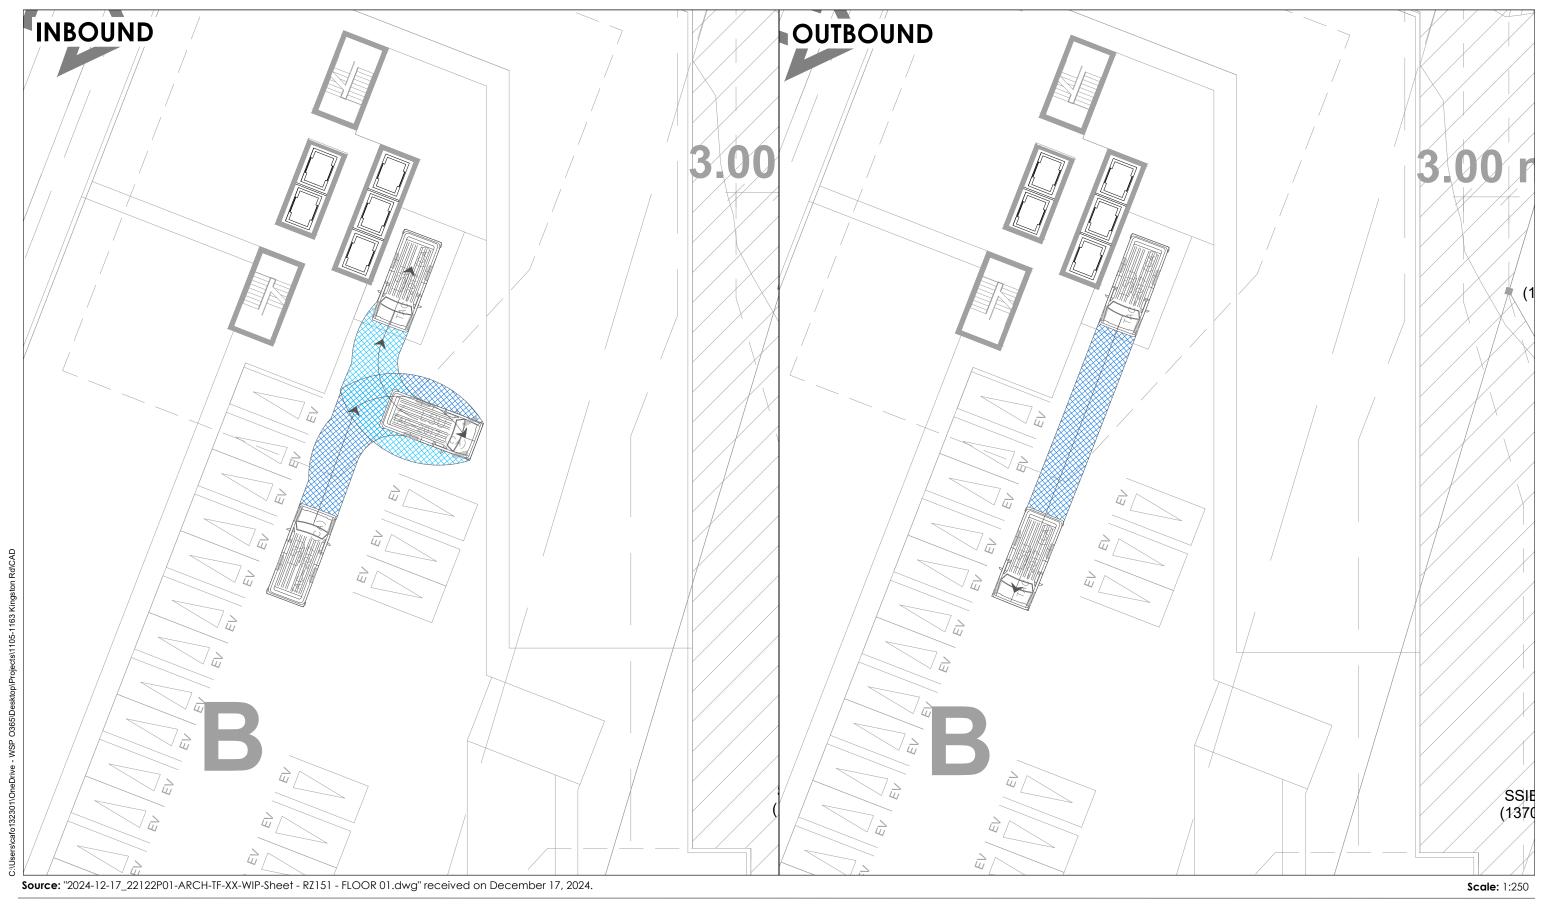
LSU Loading Truck Turning Maneuver - Building B - Loading Space 1 1105-1163 Kingston Road, Pickering
